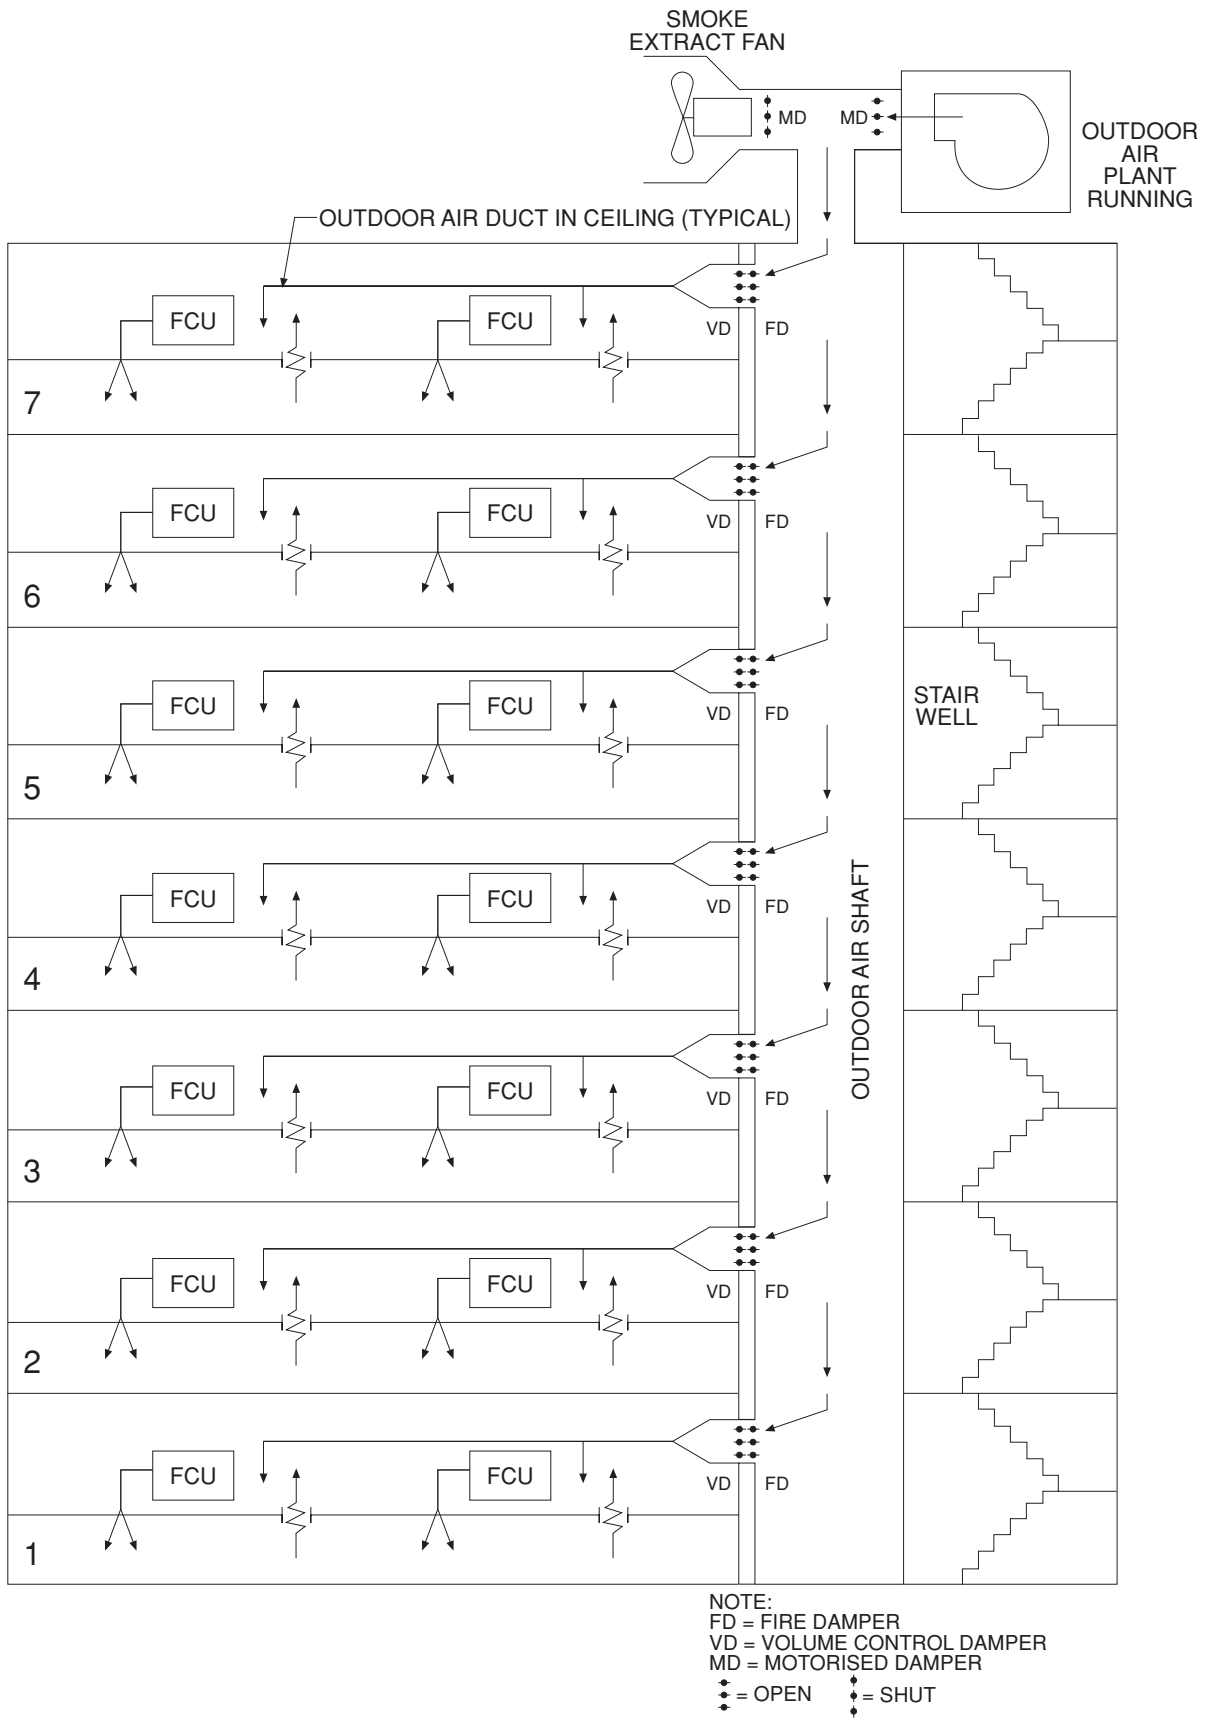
Typical floor-by-floor HVAC, fan coils
